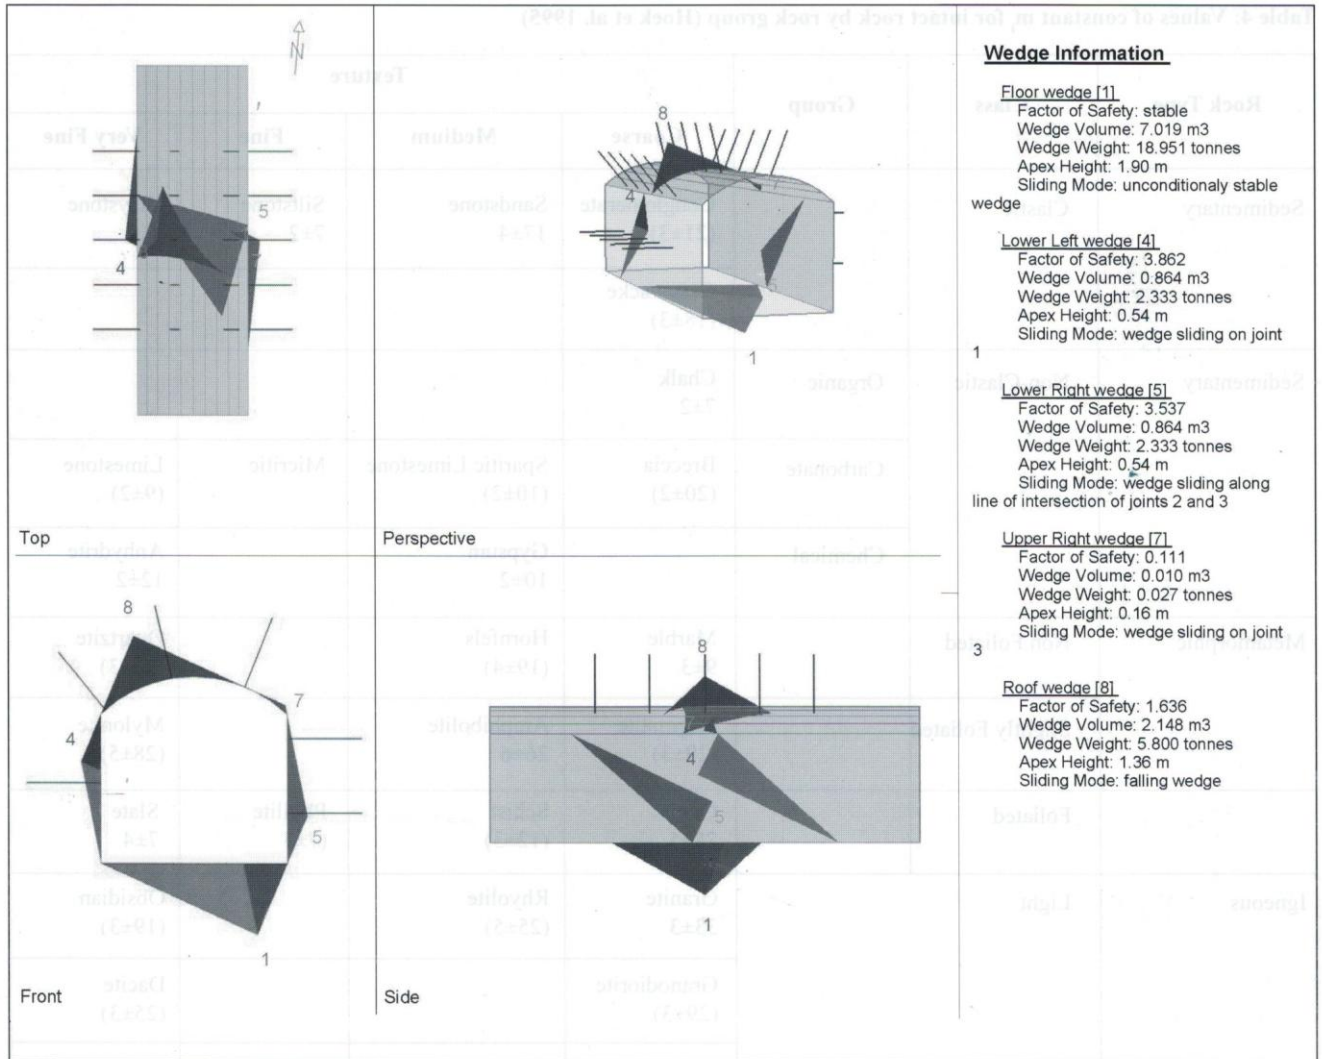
Rock bolting pattern to stabilize the roof and sidewall wedges in the tunnel
